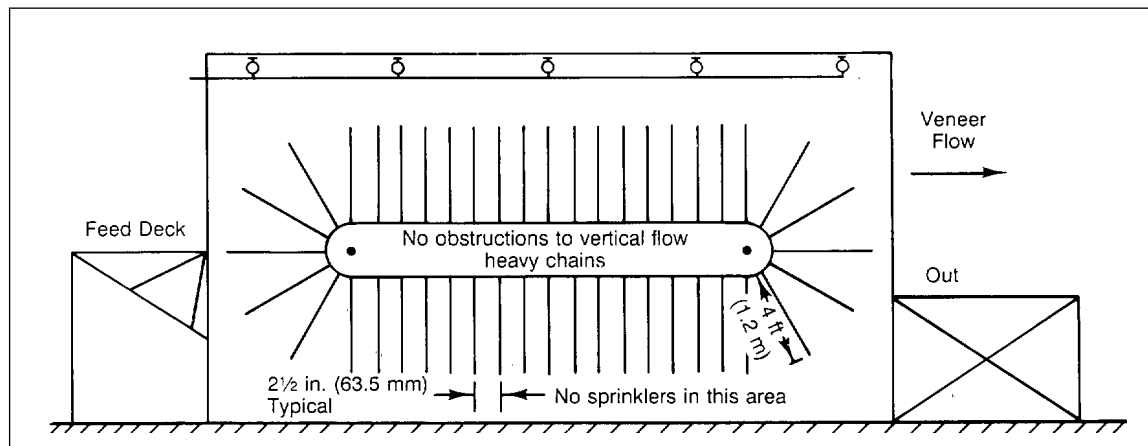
Typical arrangement of automatic sprinkler protection for wicket-type veneer dryer.
